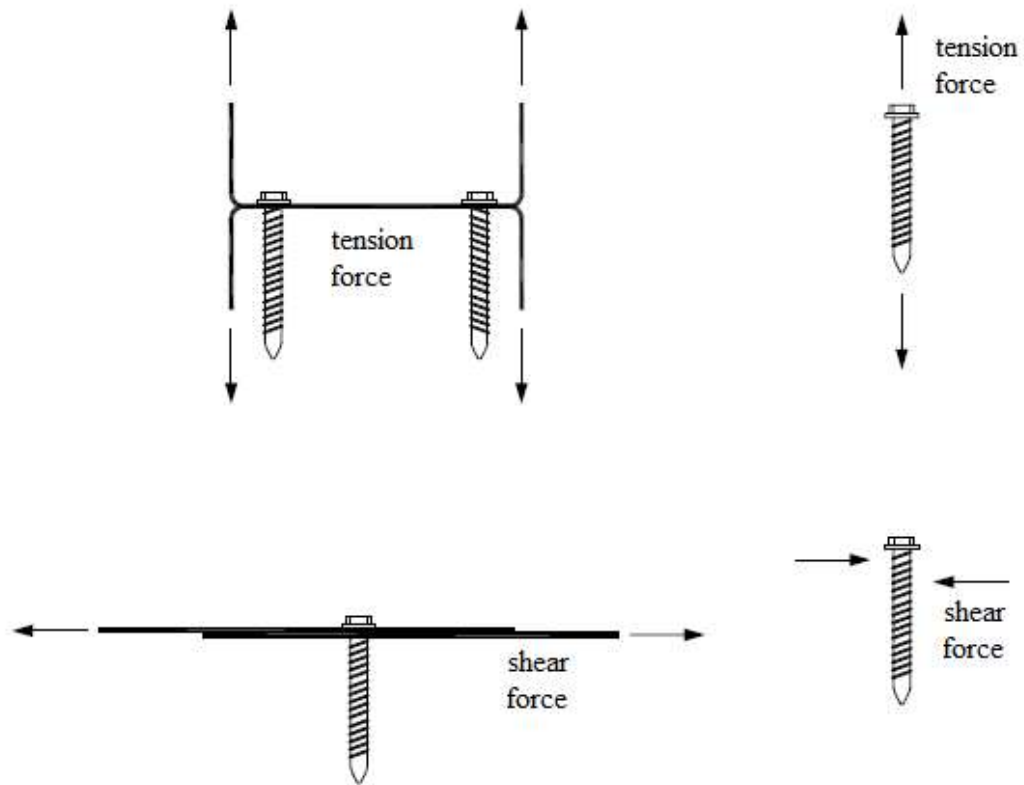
Screw loaded in shear or tension (Serrette *et al.*, 2009)
